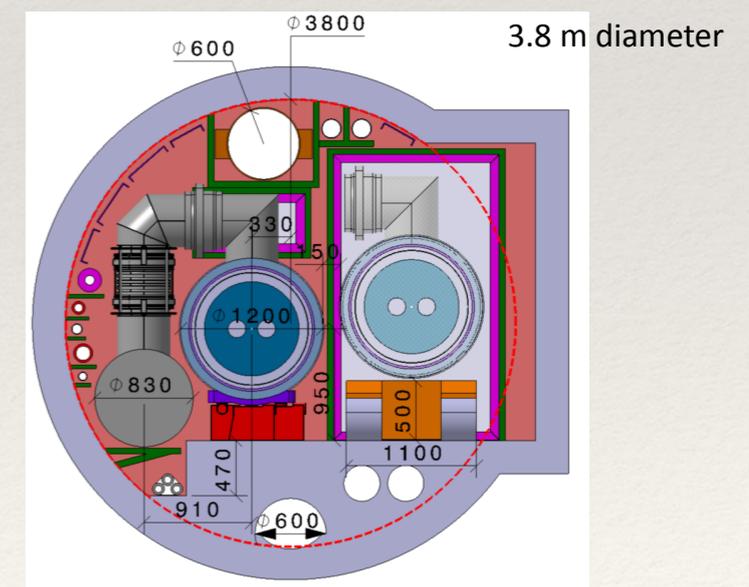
Tunnel cross section at fire compartment separation wall.
